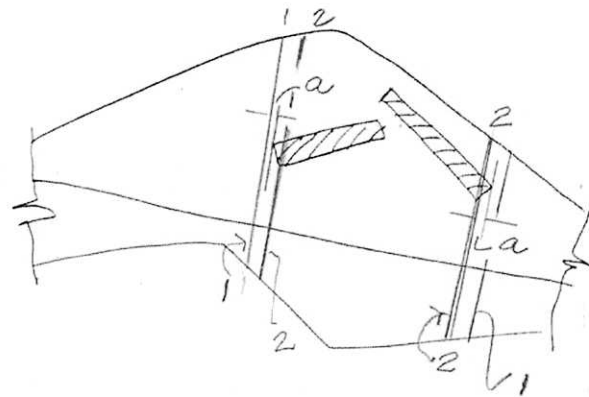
WALL-SPECIFIC DESIGN SECTIONS
